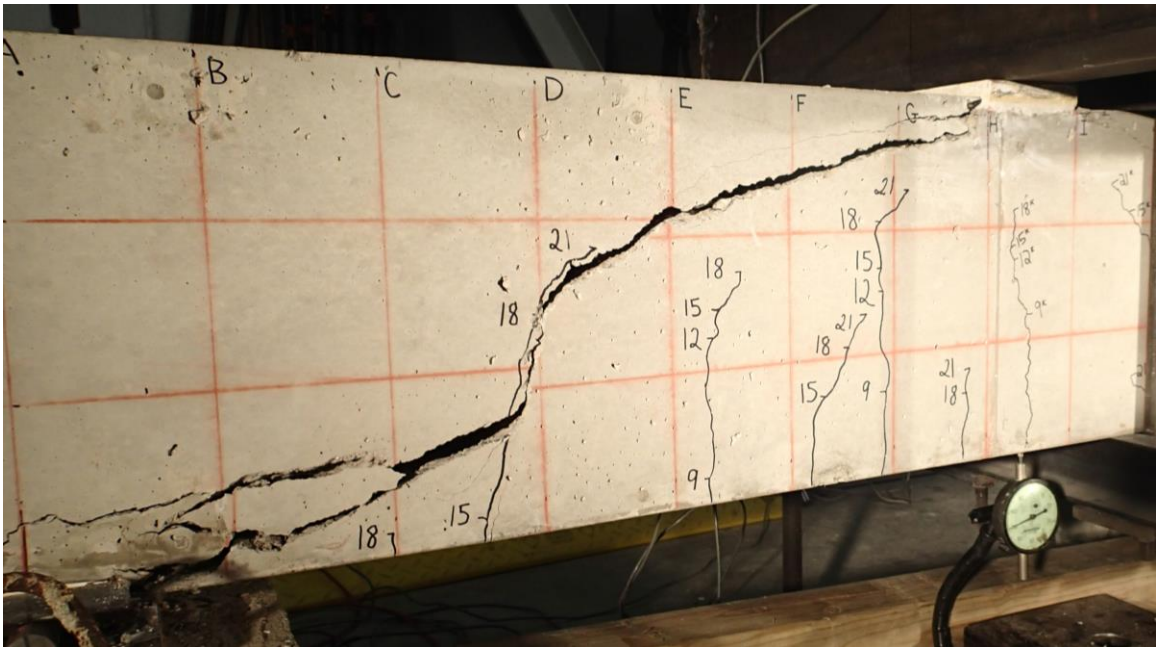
Specimen F-4: North Side Failure Inclined Crack
